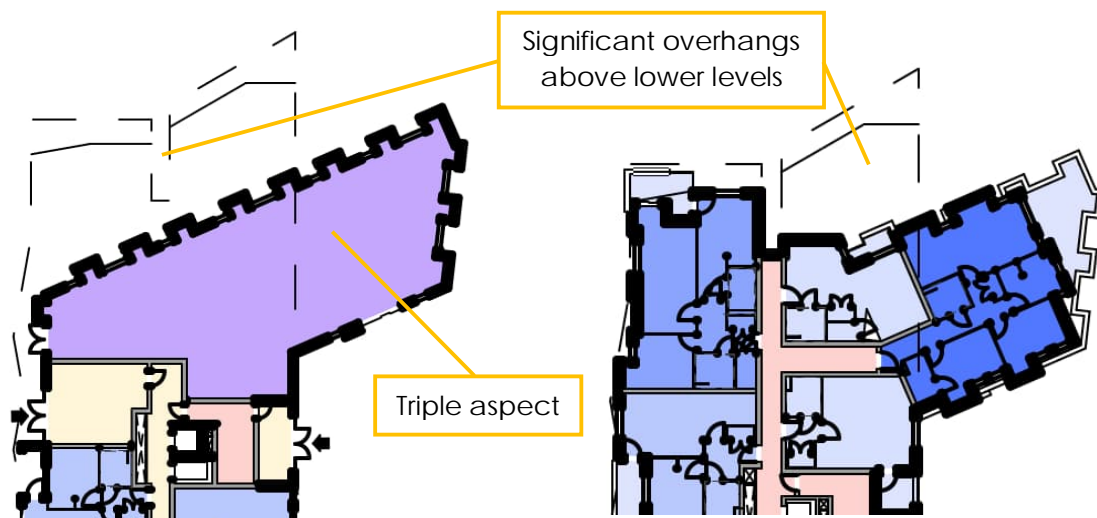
Plan view of the lower ground commercial space & upper ground residential use
